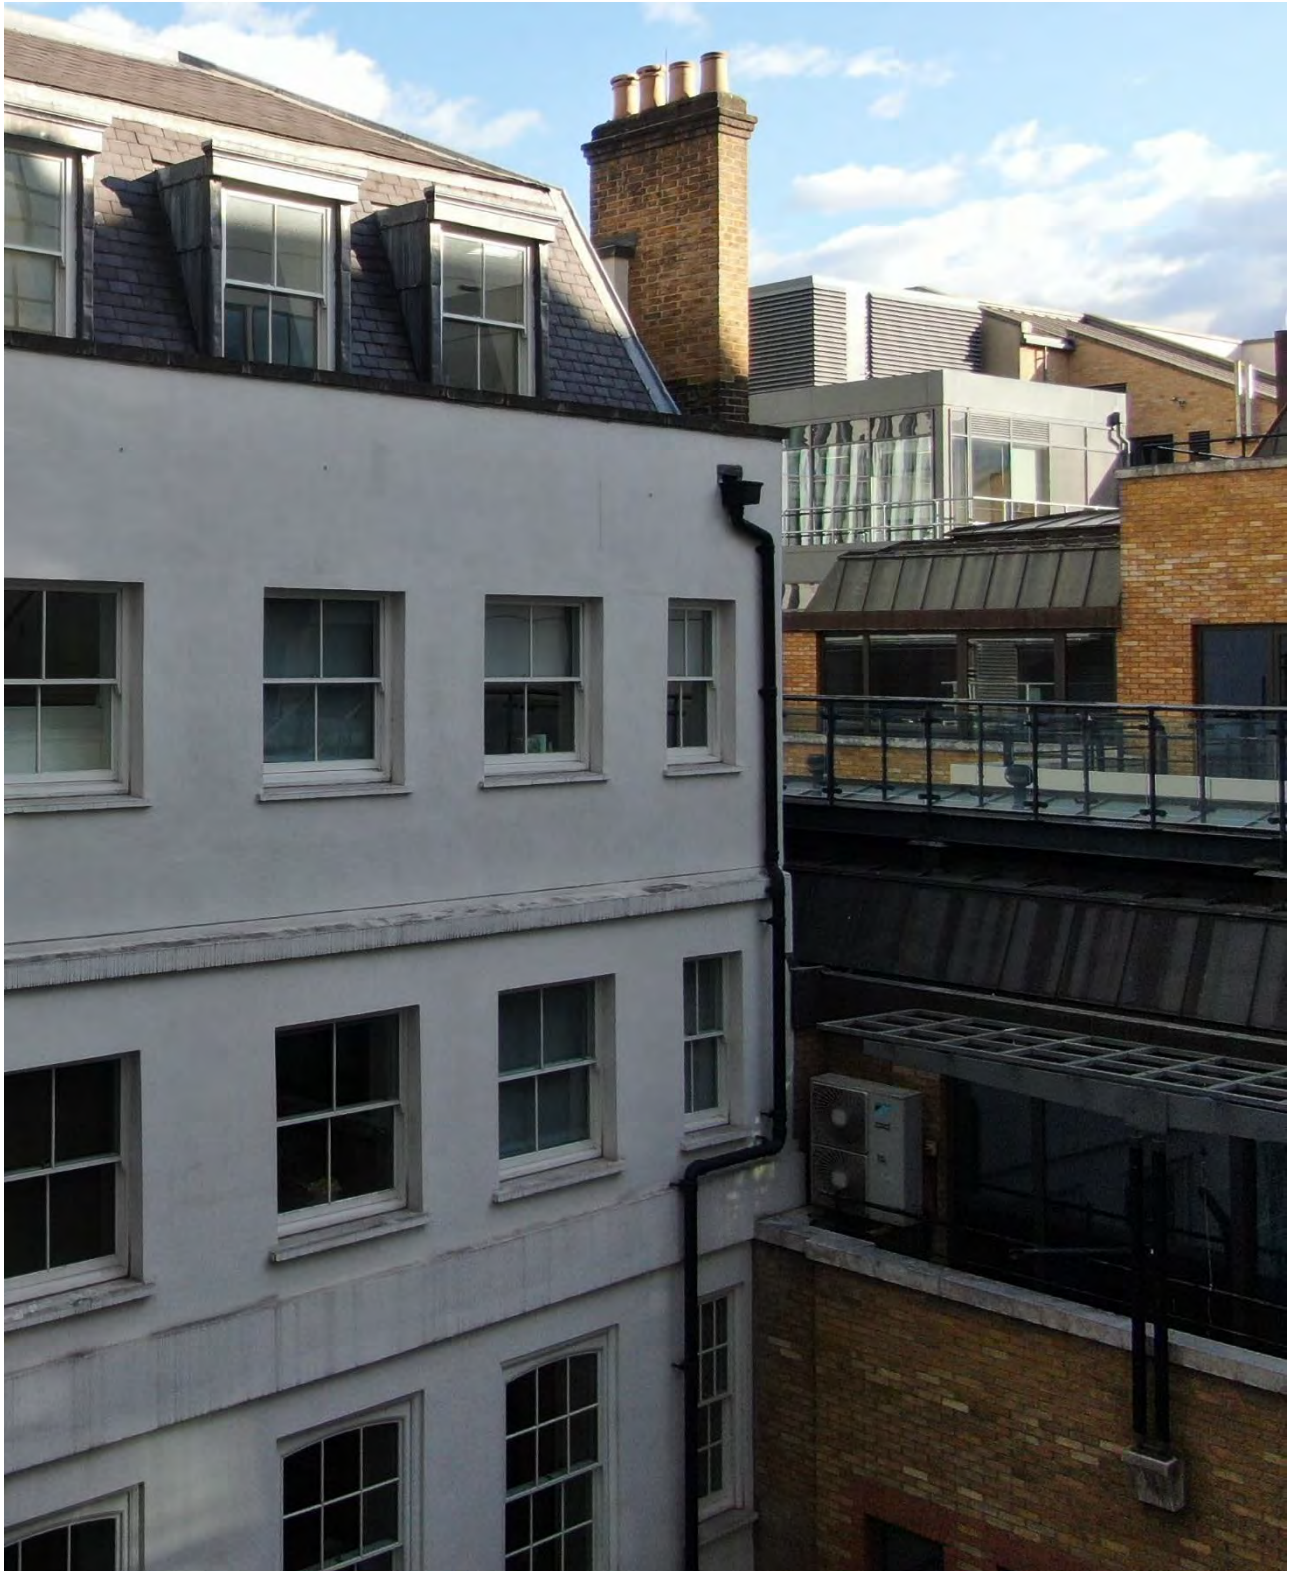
The top part of the west elevation of the listed building, where the existing structure steps back.
